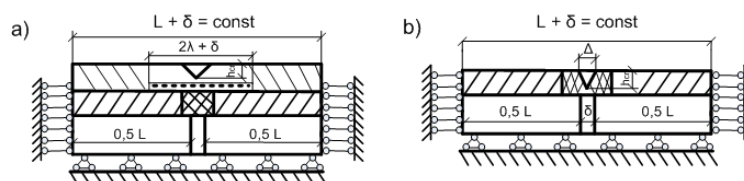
Design models for the calculation of stresses in asphalt concrete pavement after the repair and re-crack formation:
